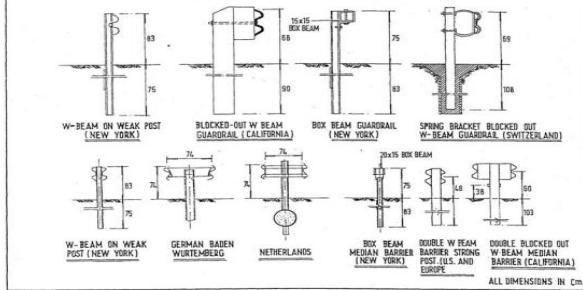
SEMIRIGID GUARDRAIL SYSTEMS AND MEDIAN BARRIER SYSTEMS
